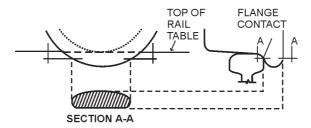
Sectional plan of wheel flange at the level of flange-to-rail contact
